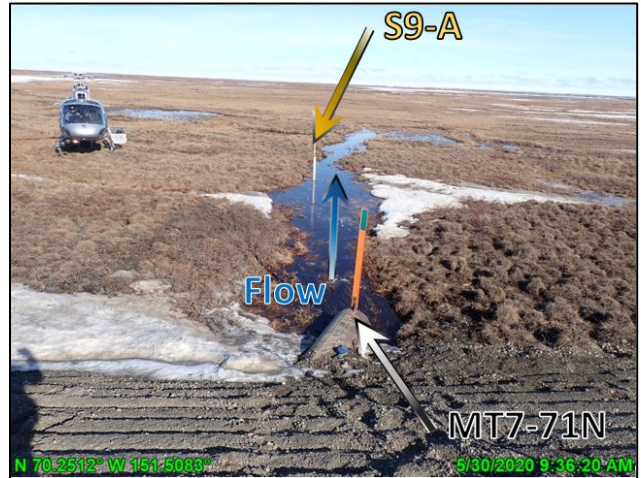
Flow through culvert MT7-71, looking north; May 30, 2020
